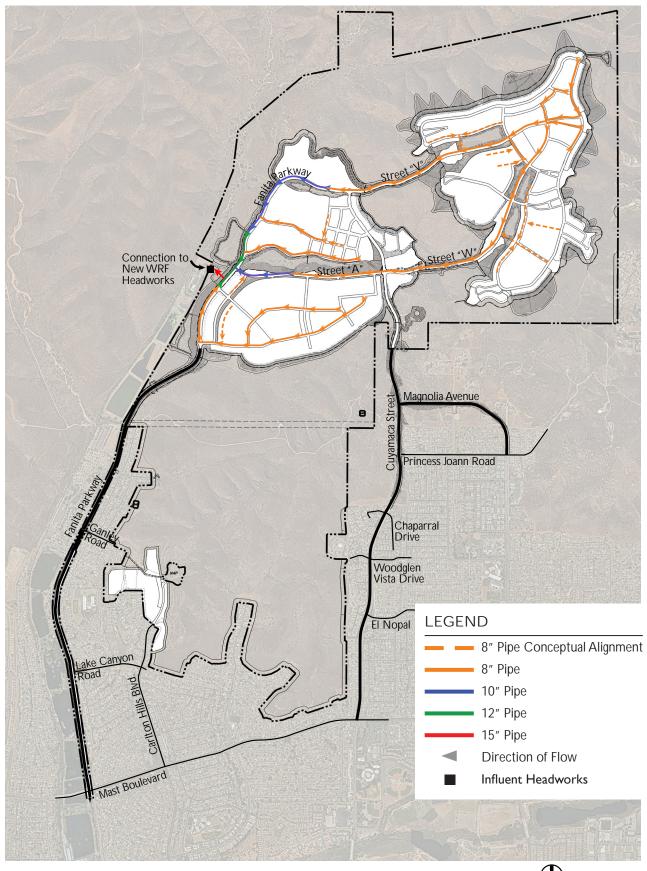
Conceptual Sanitary Sewer Plan
